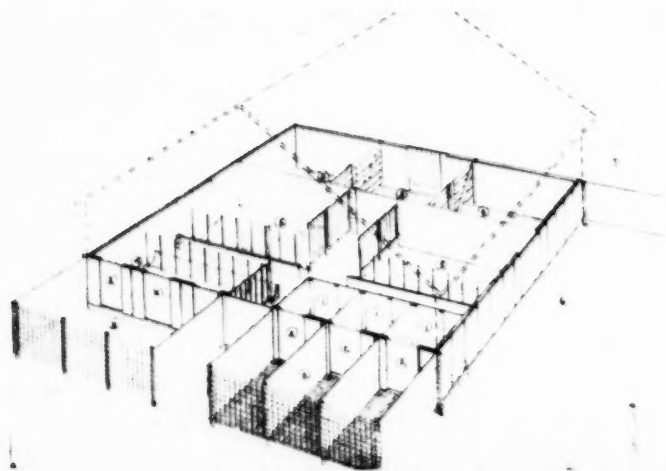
A separate young stock barn. Note separate young calf pens adjacent to the south end with outside-run pens. When calf doors are open, this block off windows so inside pens are shaded
